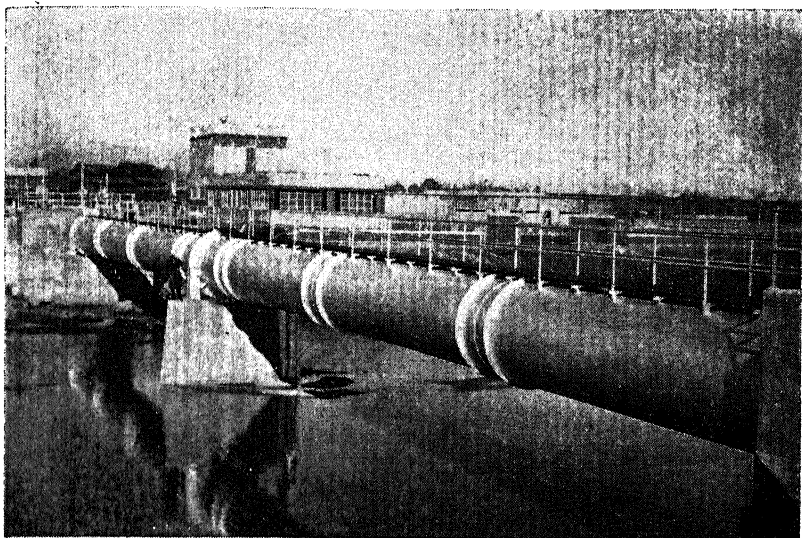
Arc welded design with stiffener rings prevents distortion at points of support and permits self-supporting spans of 105 feet in the construction of this 78-inch sewage line river crossing.
